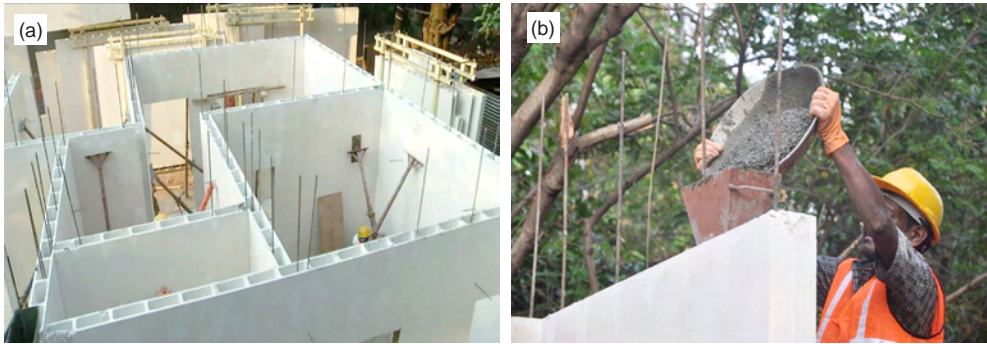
(a) Wall panels at the ground floor have been erected, and (b) pouring of concrete into wall panel cavity
